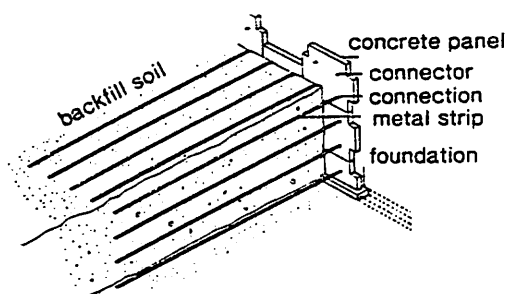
Standardized cruciform concrete panels facing for R. E. retaining walls (Vidal, 1978).
